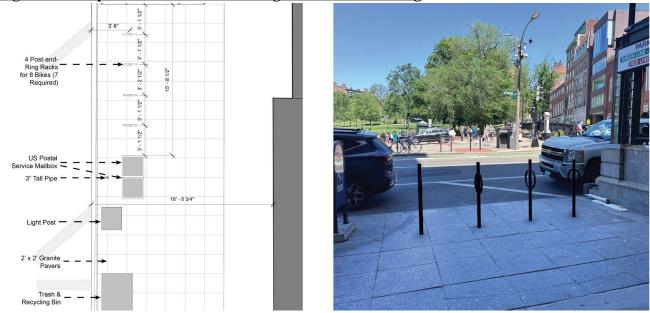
Proposed Visitor Bike Parking Plan and Rendering
